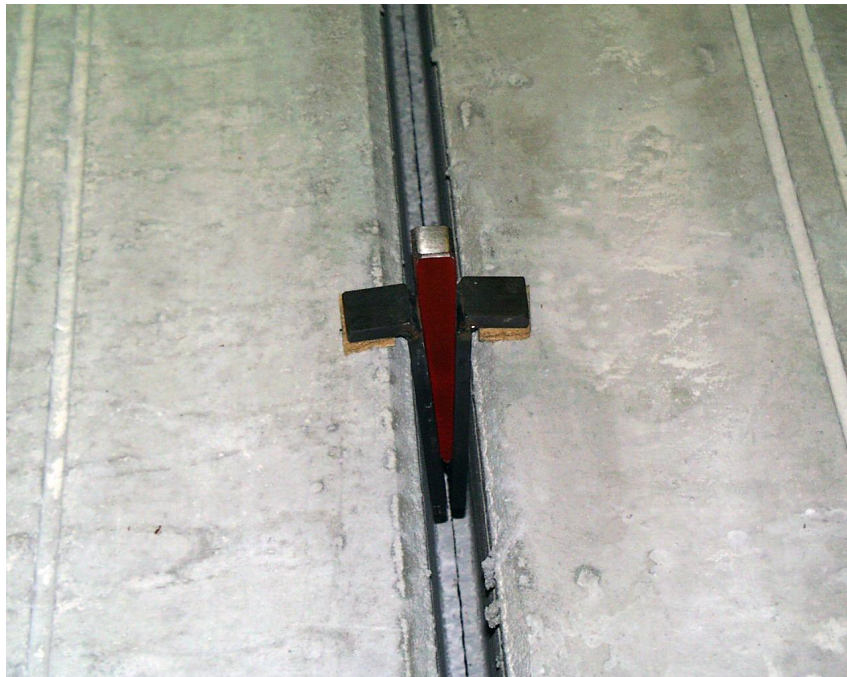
Design of wedging equipment to create longitudinal cracks in the joints.
